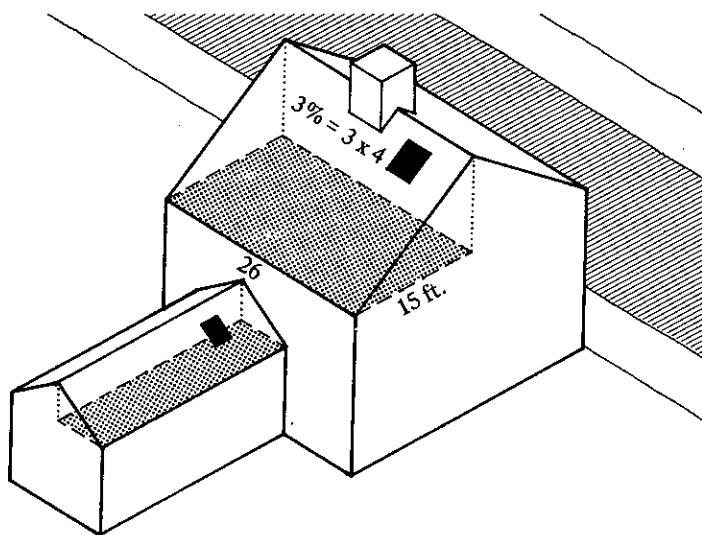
Skylights are not approved on the front roof plane. The standard size is three percent of the floor area under the roof plane.
